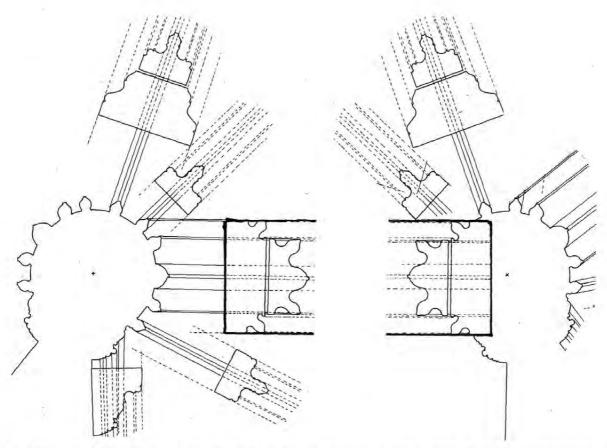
Narbonne Cathedral, plan of piers in the ambulatory at the entrance to the chapels showing the wall-framework structure (highlighted: the main frame structure of the chapel entrances) (Christian Freigang).
